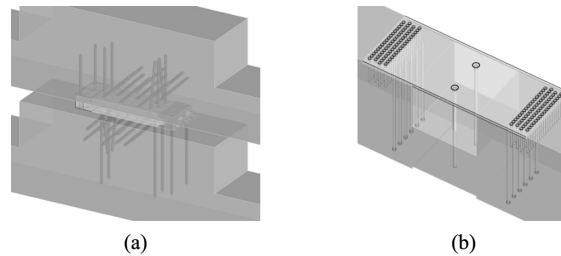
(a) Out-of-plane OoP connection, and (b) beam-to-beam B2B connection.
